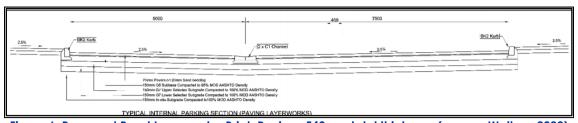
Proposed Road Layerworks: Brick Paving- 540mm total thickness (source: Walters, 2020)
